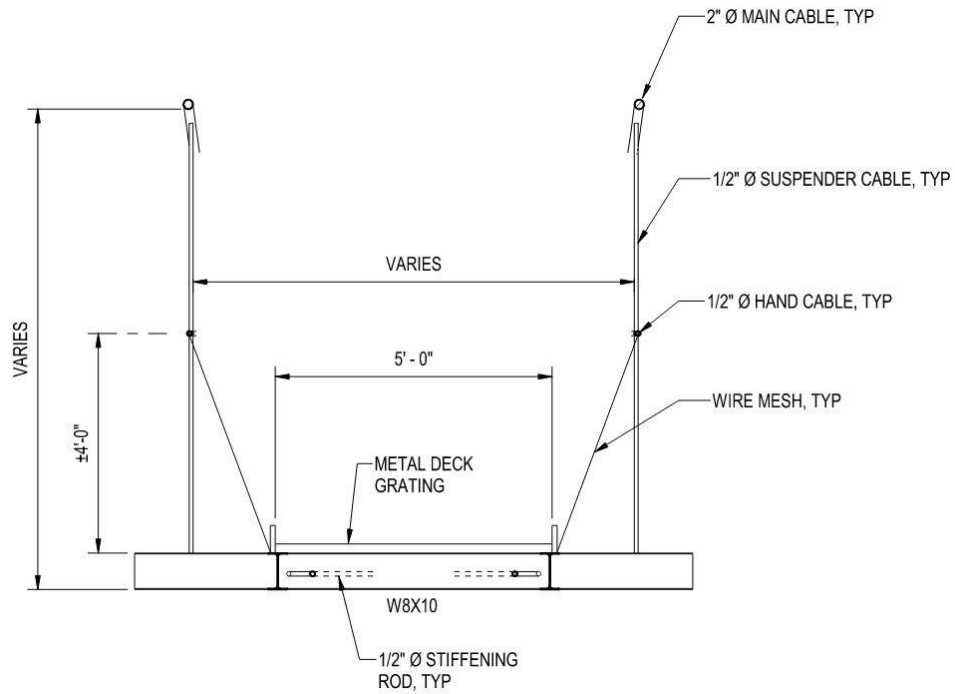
SUSPENSION BRIDGE CROSS SECTION
